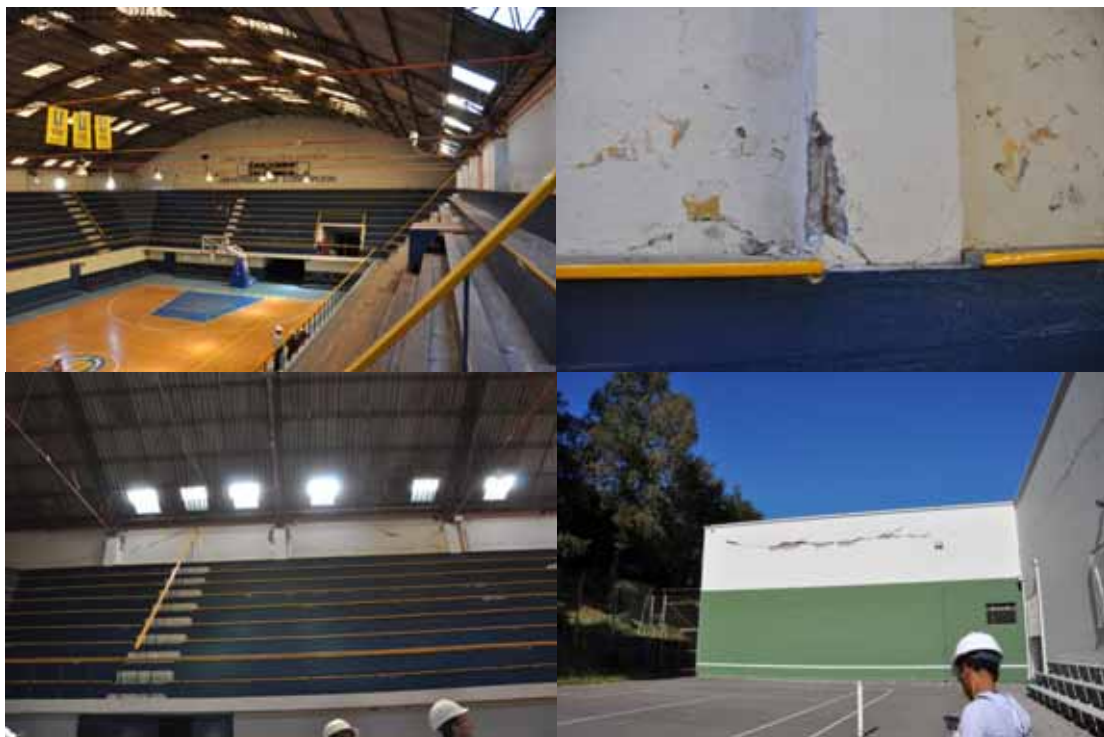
Gymnasium, University of Concepción, buckling of longitudinal reinforcement and cover spalling, out-of-plane failure of sidewalls at the wall discontinuity
